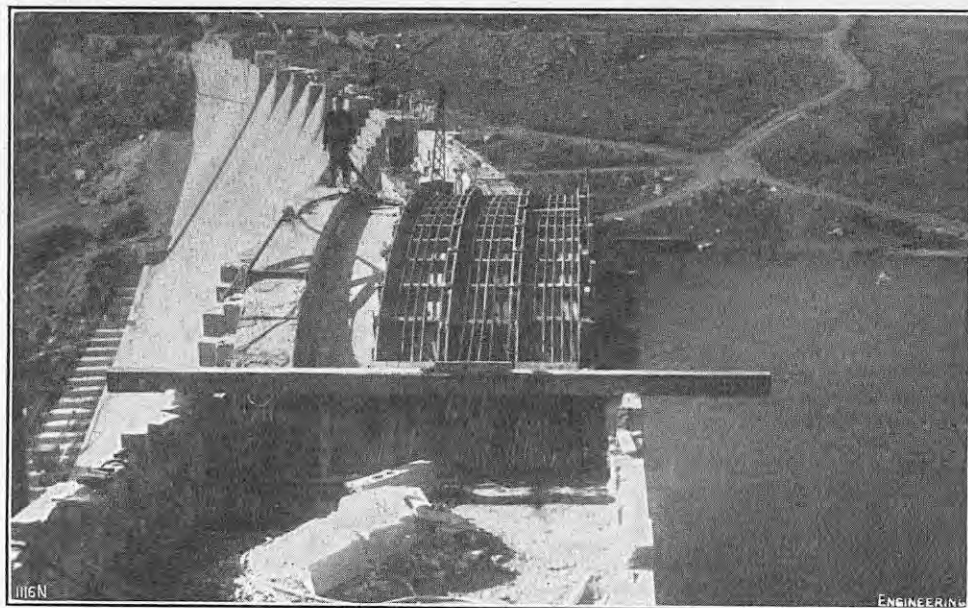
PRE-CAST ARCH RIBS OF 40-FT. SPAN READY FOR CONCRETING.
